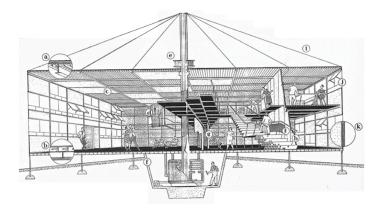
Demountable Space sectional rendering, from U.S. Gypsum's advertisement (Architectural Forum, March 1942).
